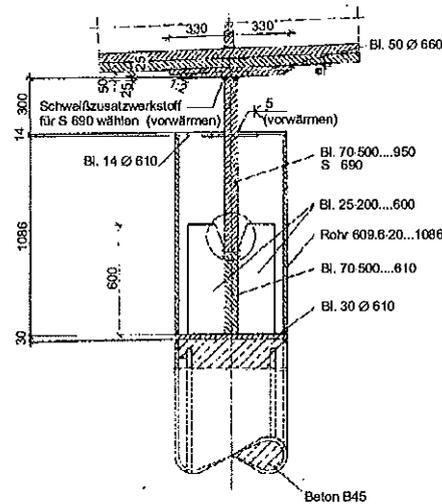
Pier and pier-girder connection of a bridge near Ingolstadt.
